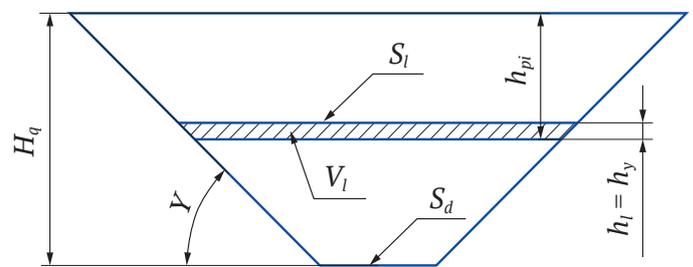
Scheme for determining the volume of layers to be excavated within a pit envelope: S_l is layer area, m^2 ; S_d is bottom area, m^2 ; V_l is layer volume, m^3 ; h_l is layer height, m ; h_y is bench height, m ; h_{pi} height from the top elevation of a pit (daylight surface) to the bottom elevation of a layer, m ; Y is overall pit slope angle, deg ; H_q is pit wall height
